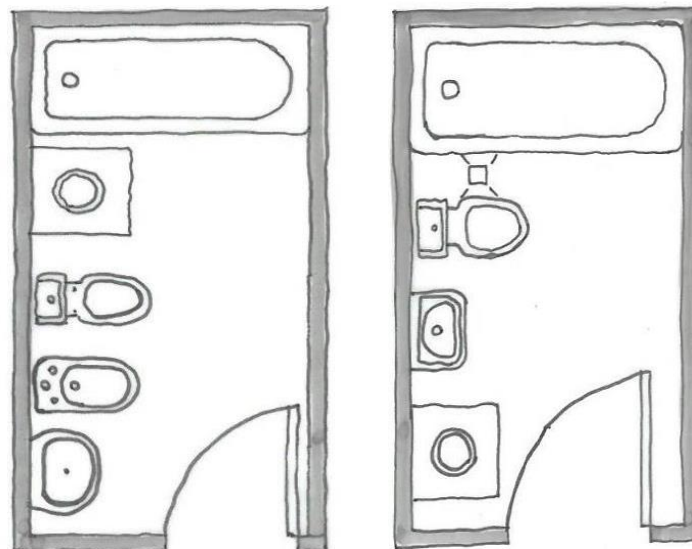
Sample plans of the bathroom spaces with laundry facilities
